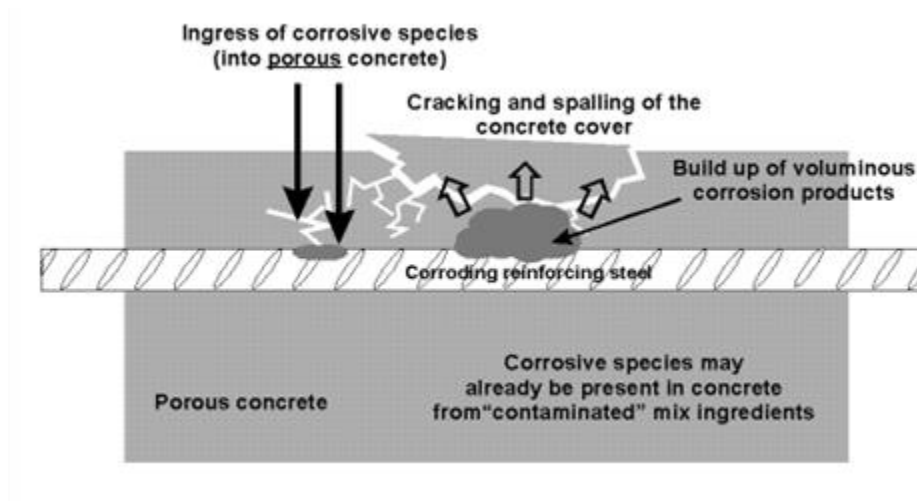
Schematic diagram showing spalling of concrete due to corrosion damage
